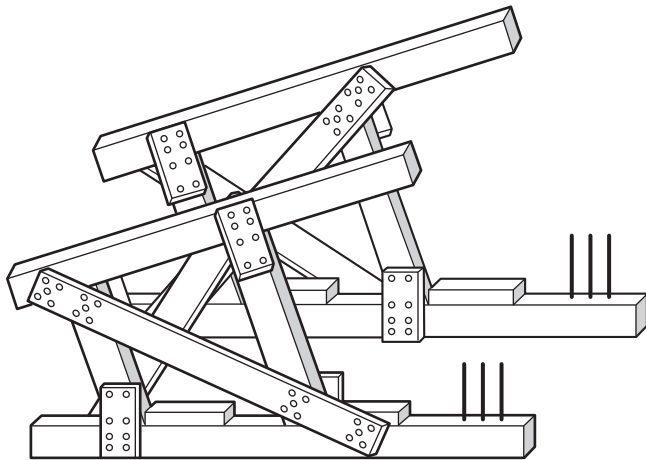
(c) Sloped Floor Shore Type 2.
